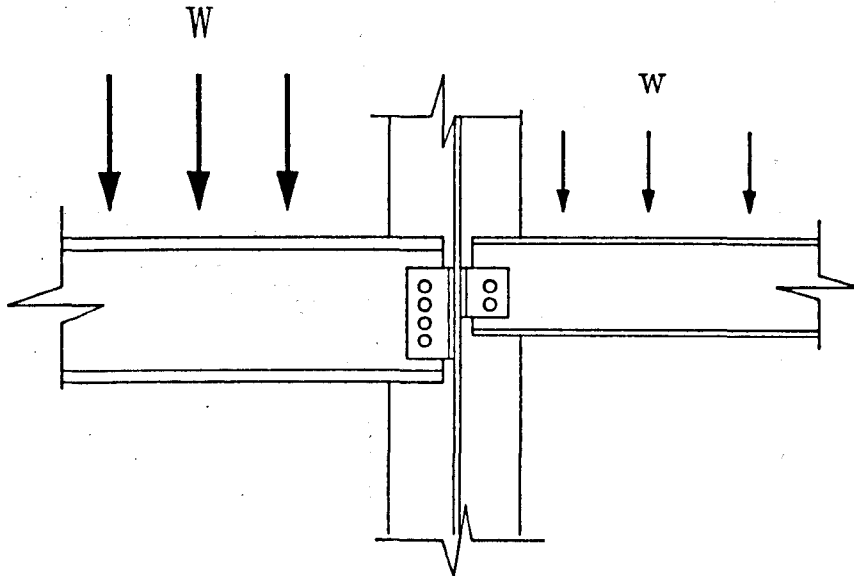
Internal column with a non-symmetrical arrangement of beams and connection types.
